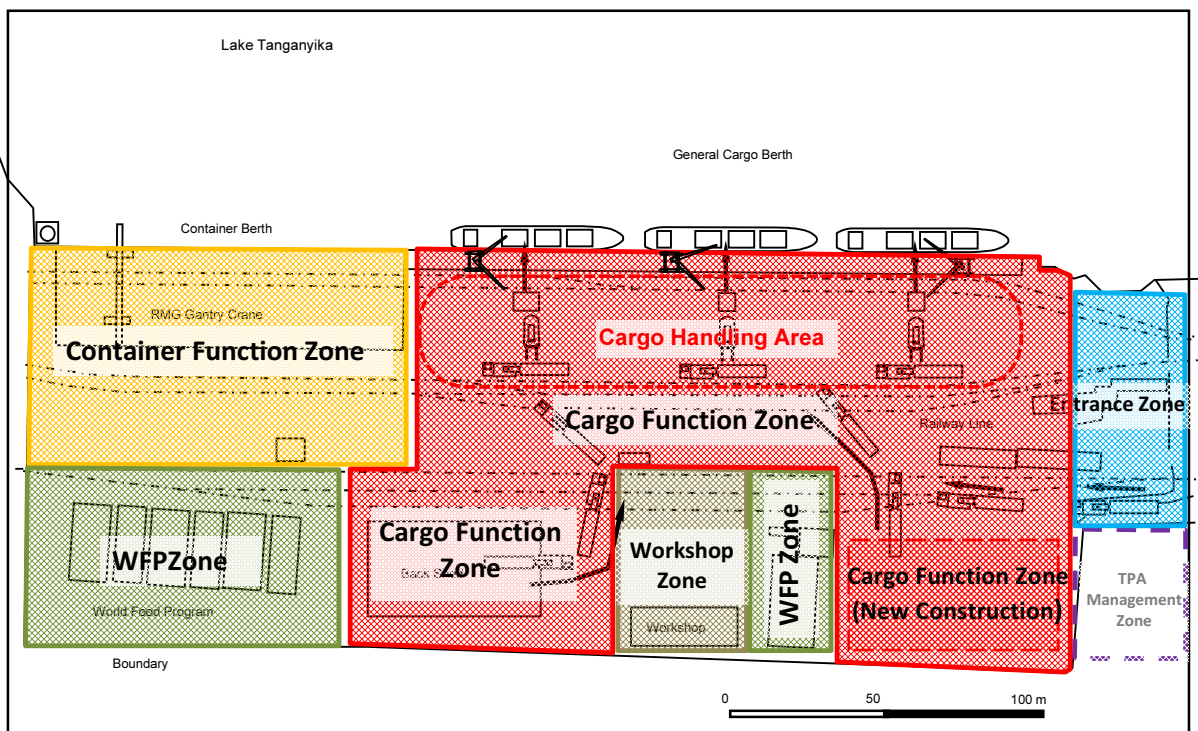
Layout Plan of Cargo Function Zone Considering Future Plan
